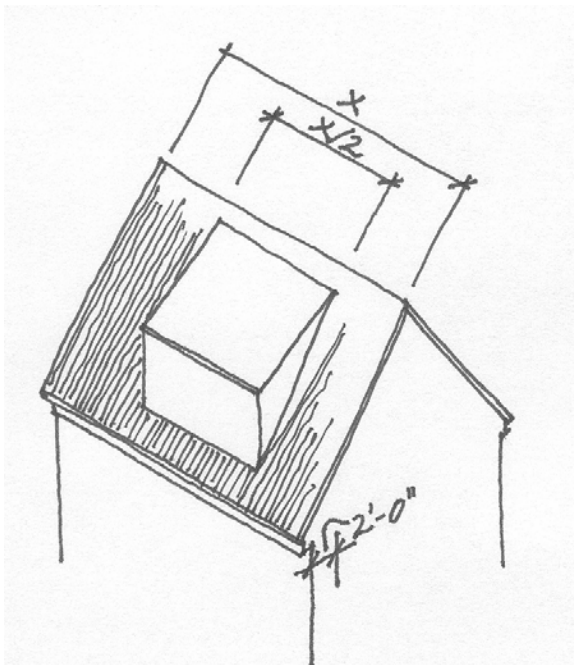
The overall width of a proposed shed dormer should not exceed one-half of the roof width.
